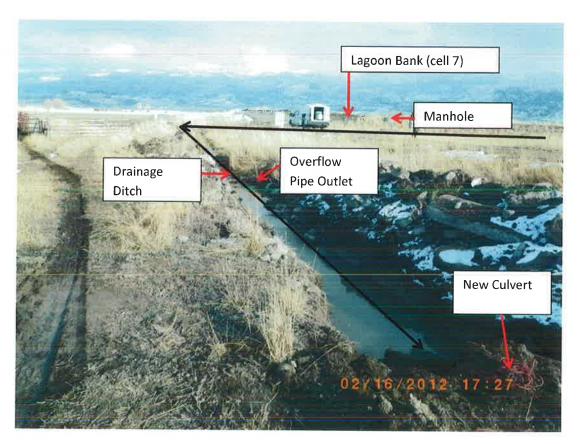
Looking east from 1100 W toward Cell 7 and drainage ditch. Note overflow pipe and manhole cover.
